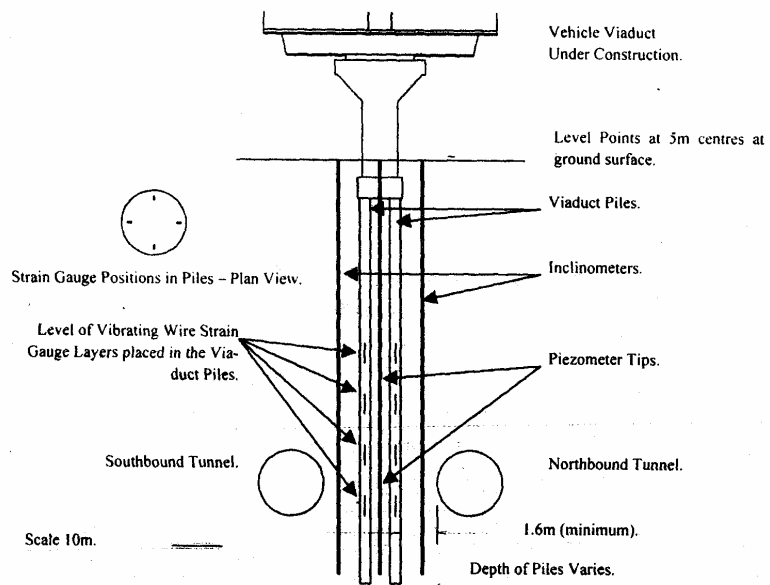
Viaduct, pile and tunnel layout (after Coutts and Wang, 2000)
